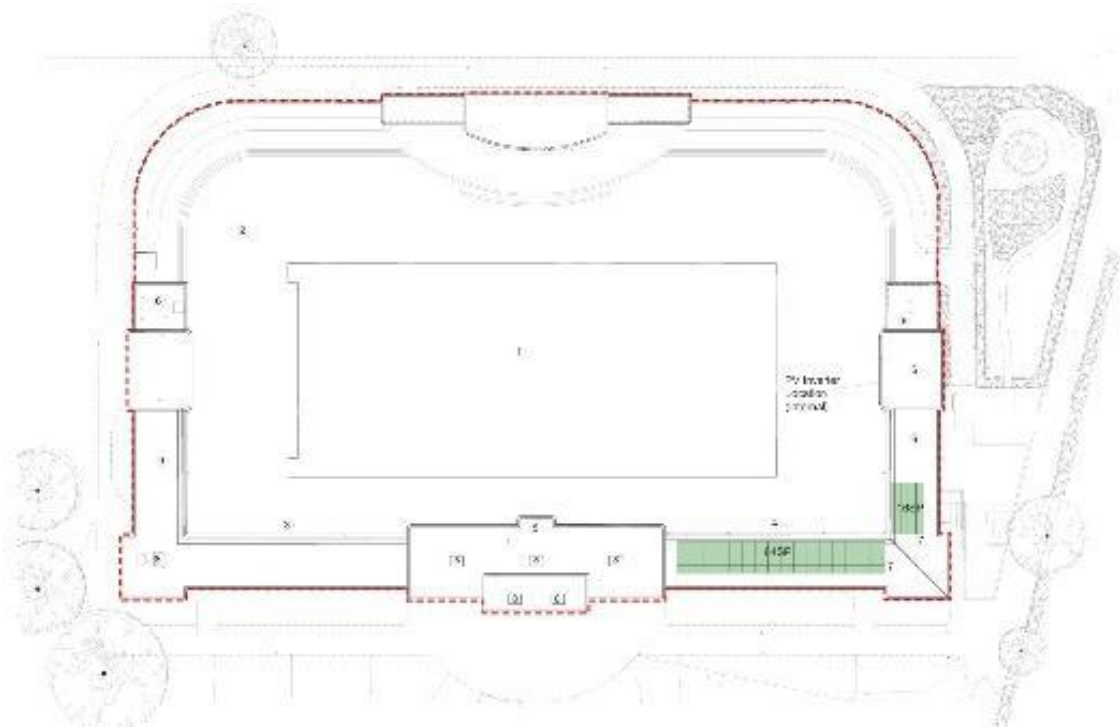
Existing Roof Plan with existing consented PV panels in light green (see drawing AP_100)
